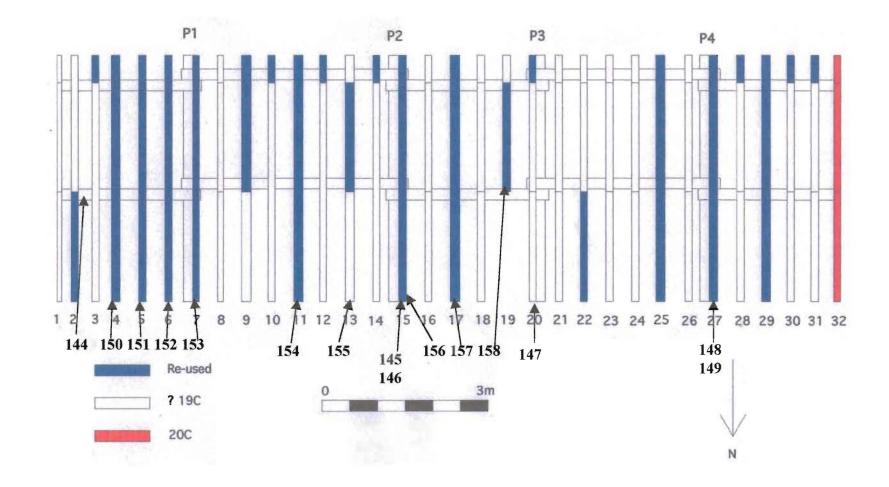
Long-section of Lady Chapel north aisle roof to show probable phasing of timbers and location of timbers sampled (viewed from the north looking south)
